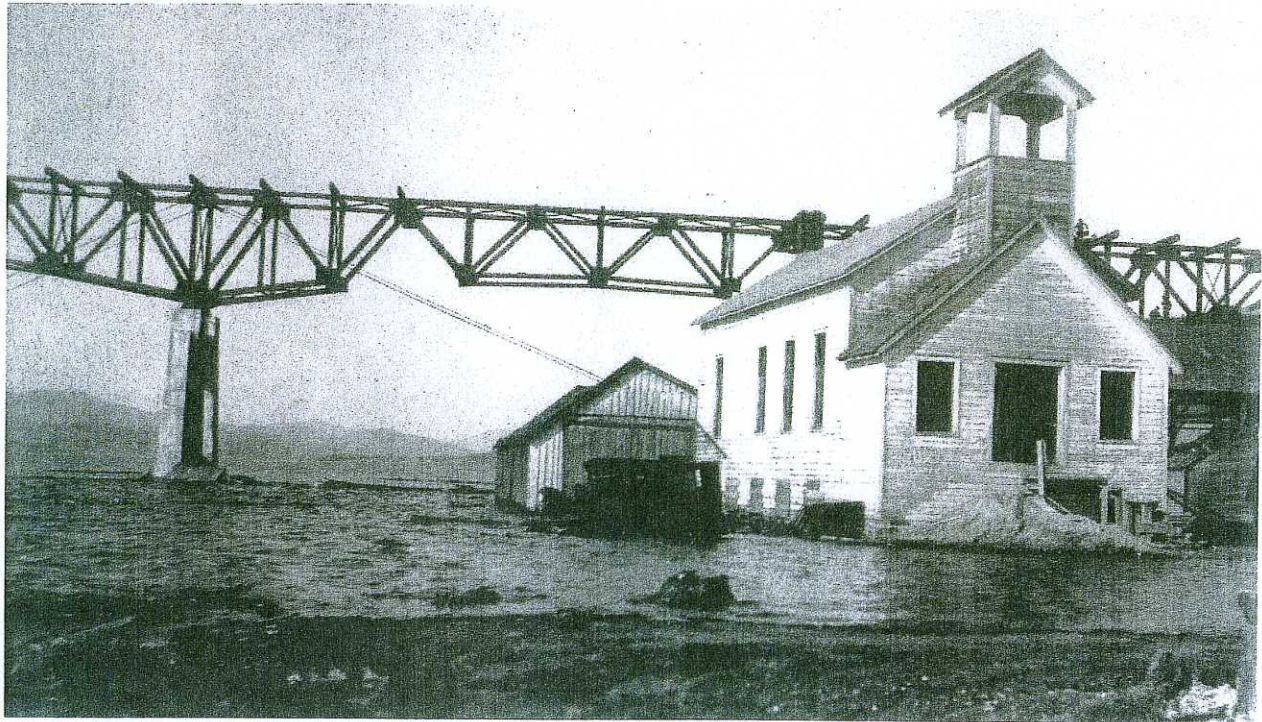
Historical view north of the Batchellerville Methodist Church. Water surrounds the foundation as the reservoir is filled. The newly constructed Batchellerville Bridge is in the background.
